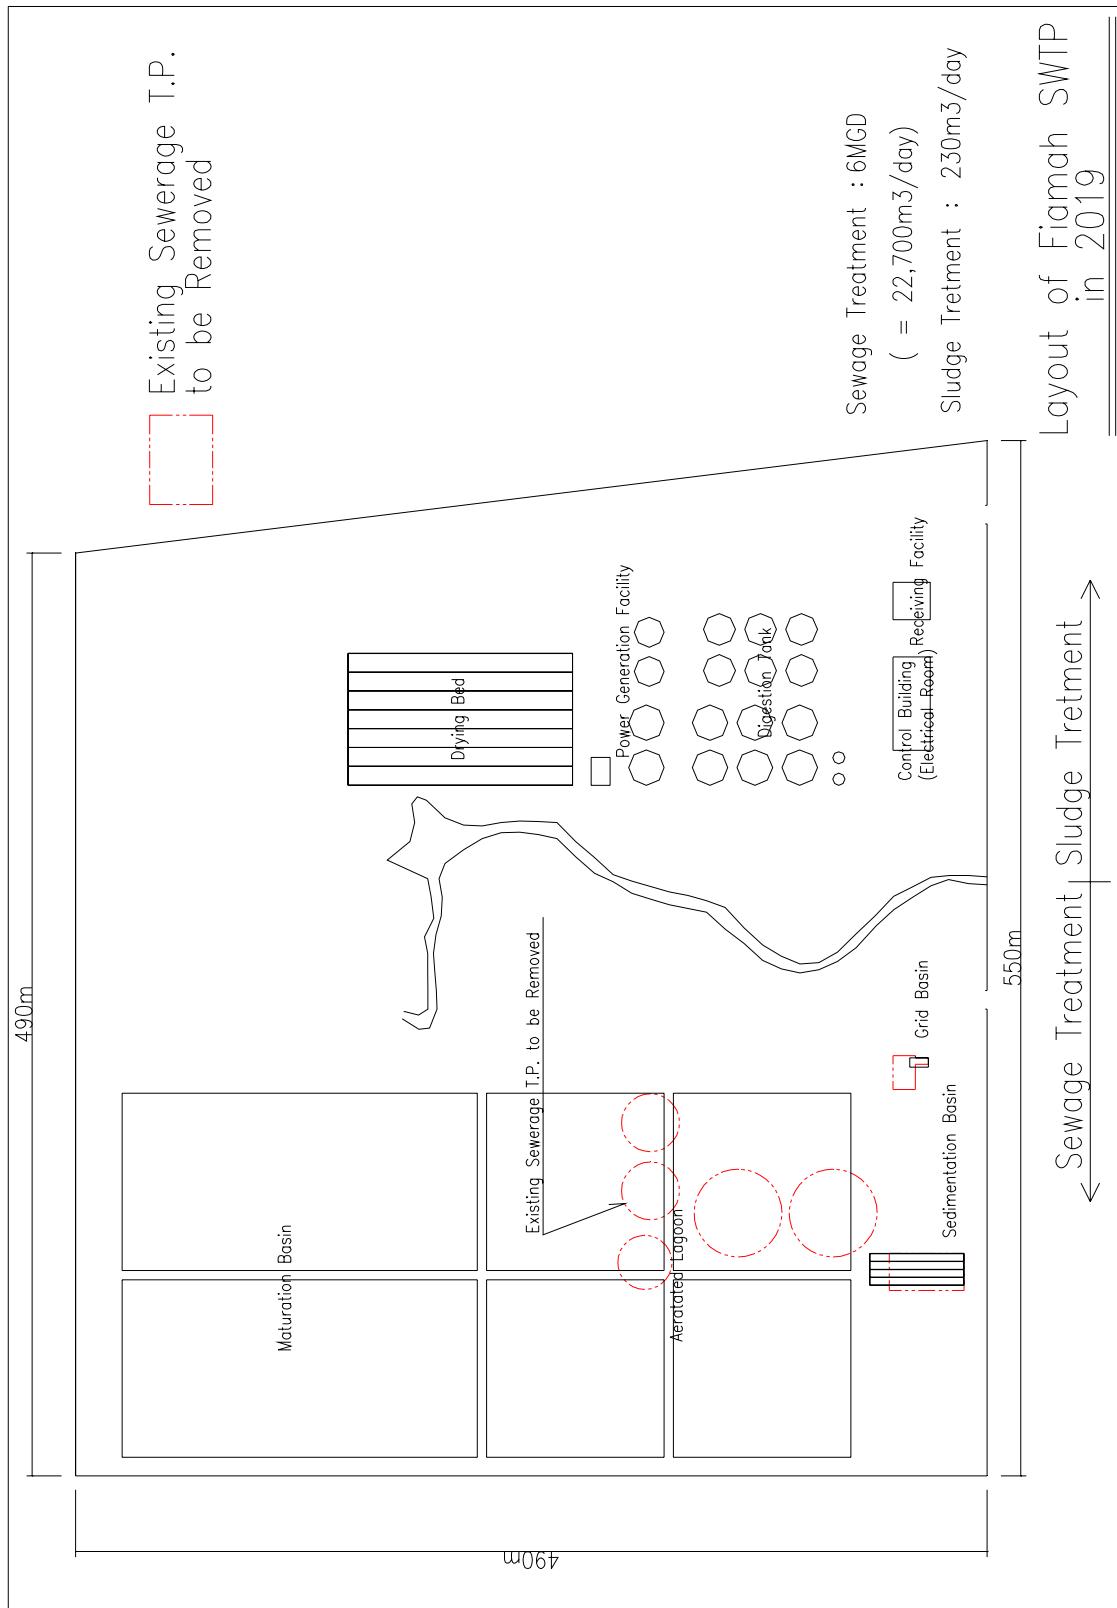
Layout of New Sewage and Sludge Treatment Plant
